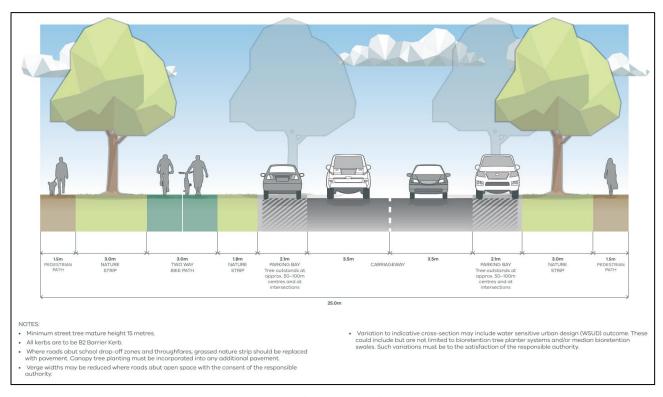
Connector street cross section - 25m (Source: VPA)
